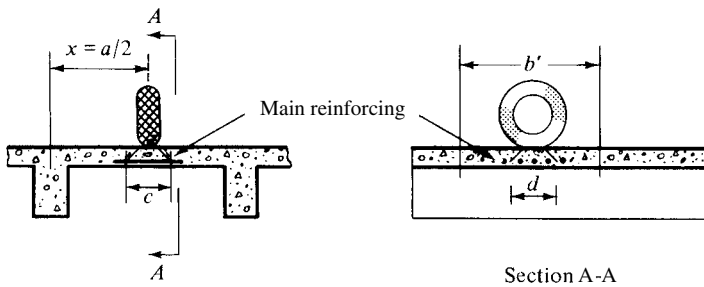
Roadway slab of a reinforced-concrete highway bridge.
